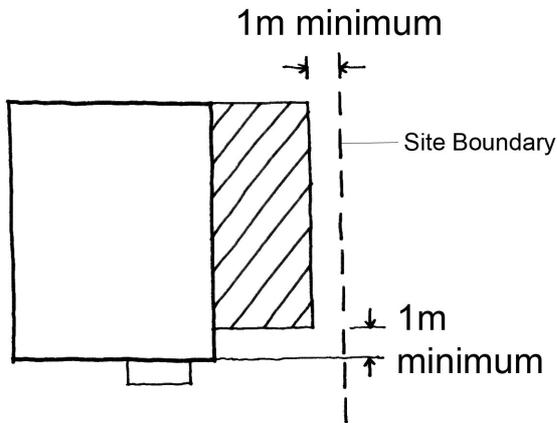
Side extensions should leave at least 1m from the side boundaries and the front main walls.
